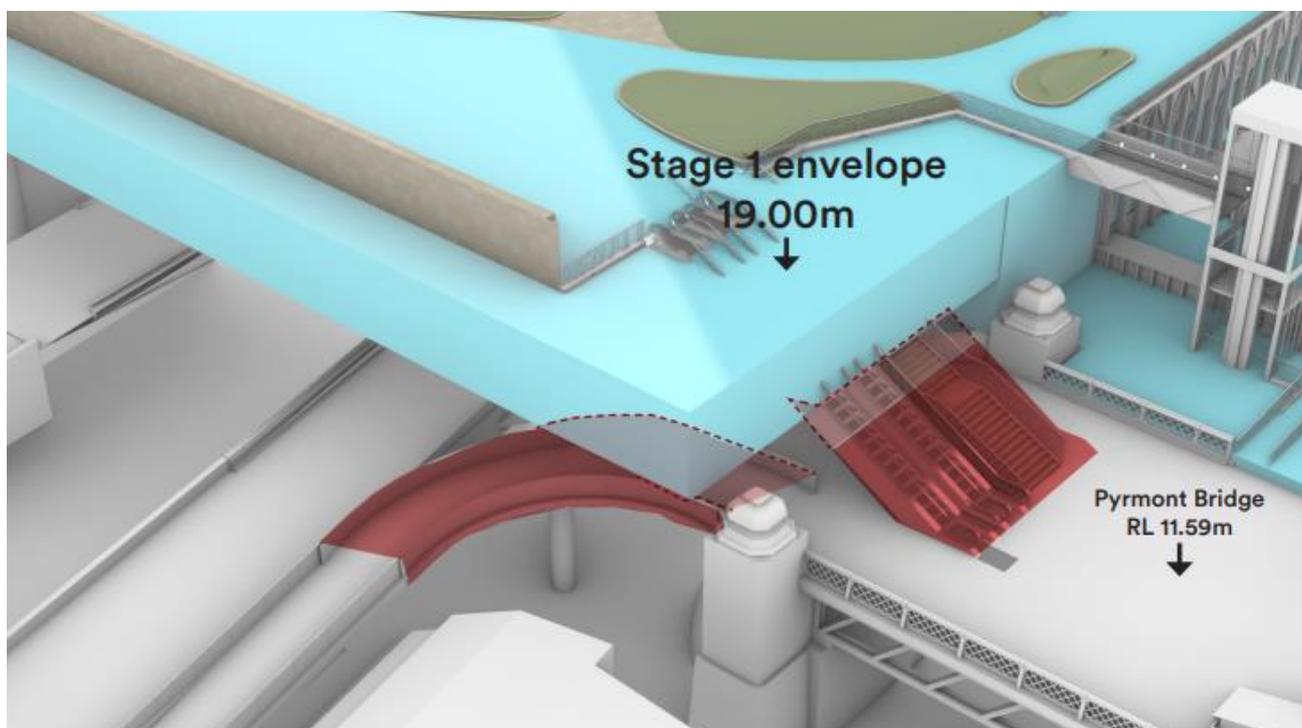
Detailed elements of the proposed Pymont Bridge pedestrian connection (as part of the concurrent Stage 2 application) that require modifications to the approved envelope
